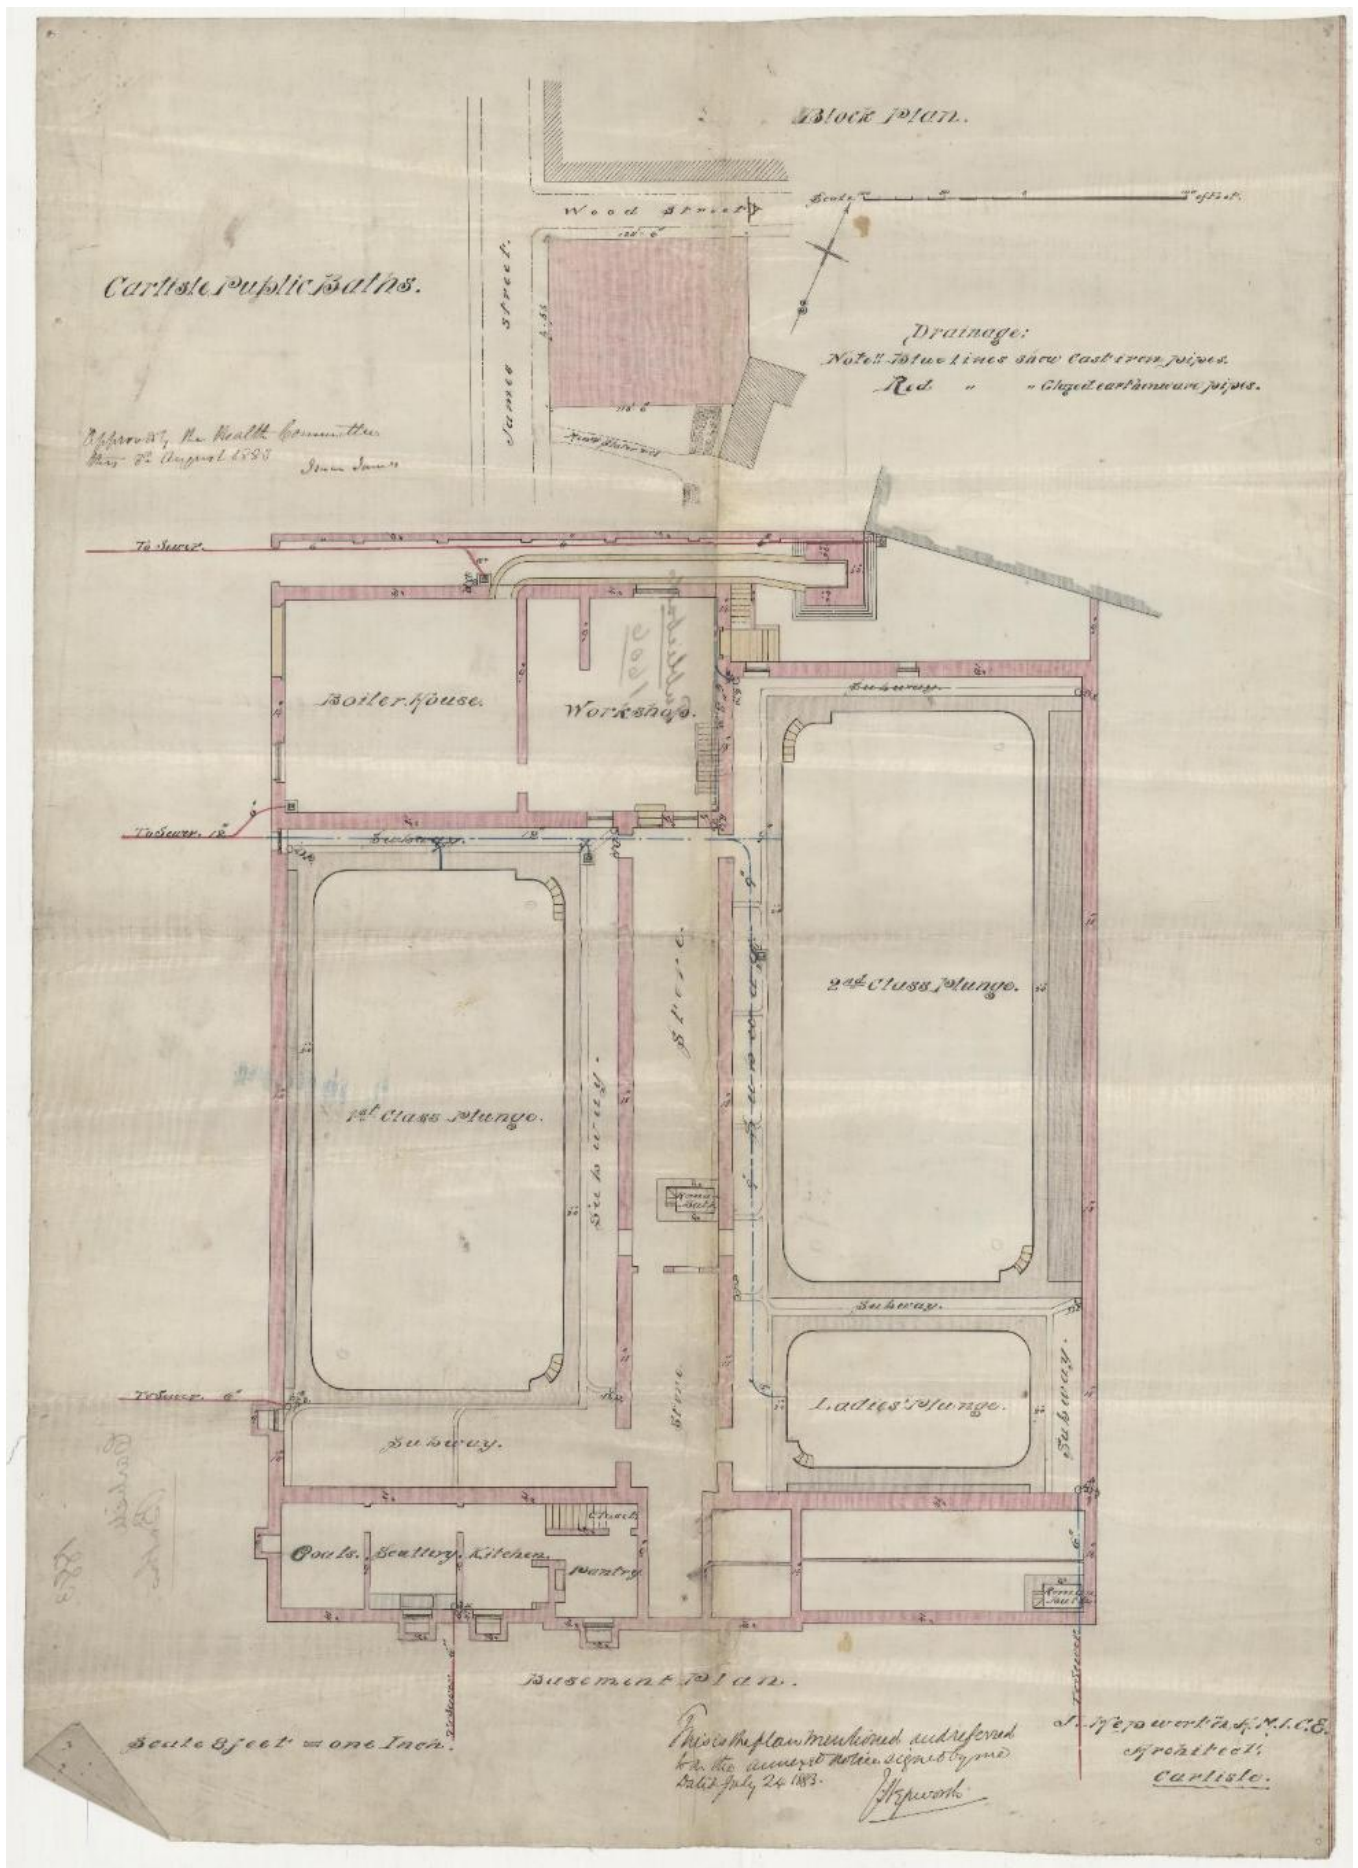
Above: Public Baths Basement Plan 1883 (Cumbria Archives)
